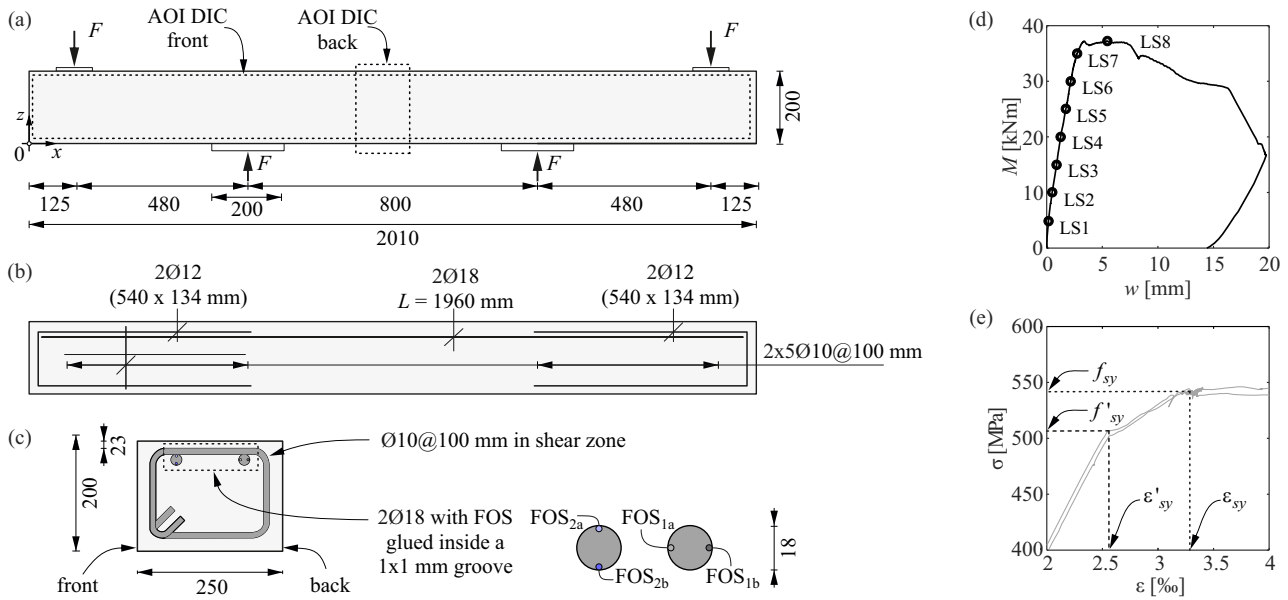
Specimen *Nn*: (a) geometry and test setup with dimensions in mm; (b) reinforcement layout; (c) geometry of the cross-section and instrumentation with fibre optical sensors (FOS) with dimensions in mm; (d) loading history against total deflections with load steps LS1 to LS8 and (e) detail of the stress–strain relationship of the QST reinforcing bars near yielding, with a yield strain and stress of the core (ϵ'_{sy} , f'_{sy}) significantly smaller than the (total) yield strain and stress (ϵ_{sy} , f_{sy})
